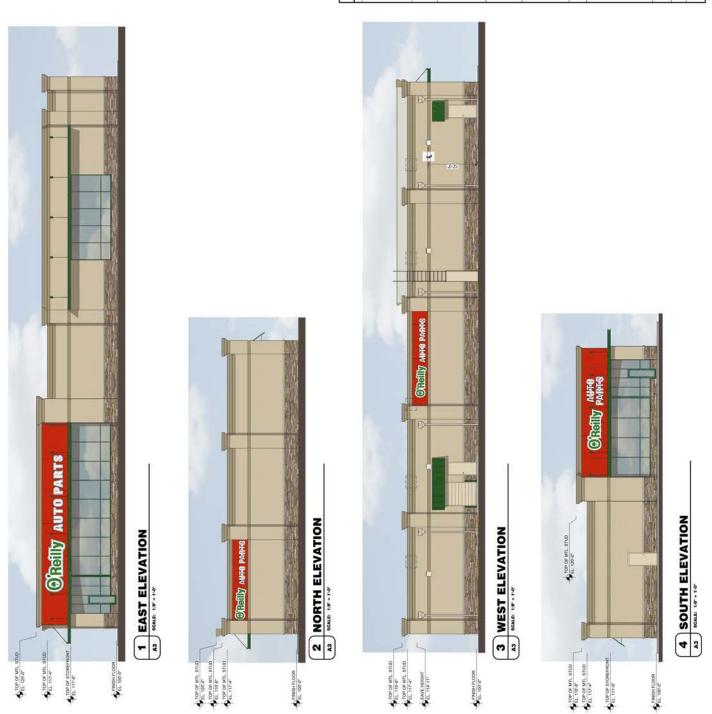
Color Preliminary Elevations dated April 18, 2014
